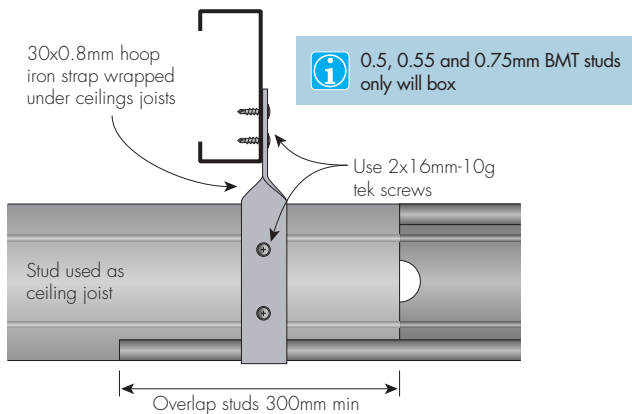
Ceiling Continuous Joist to Hoop Iron Strap
